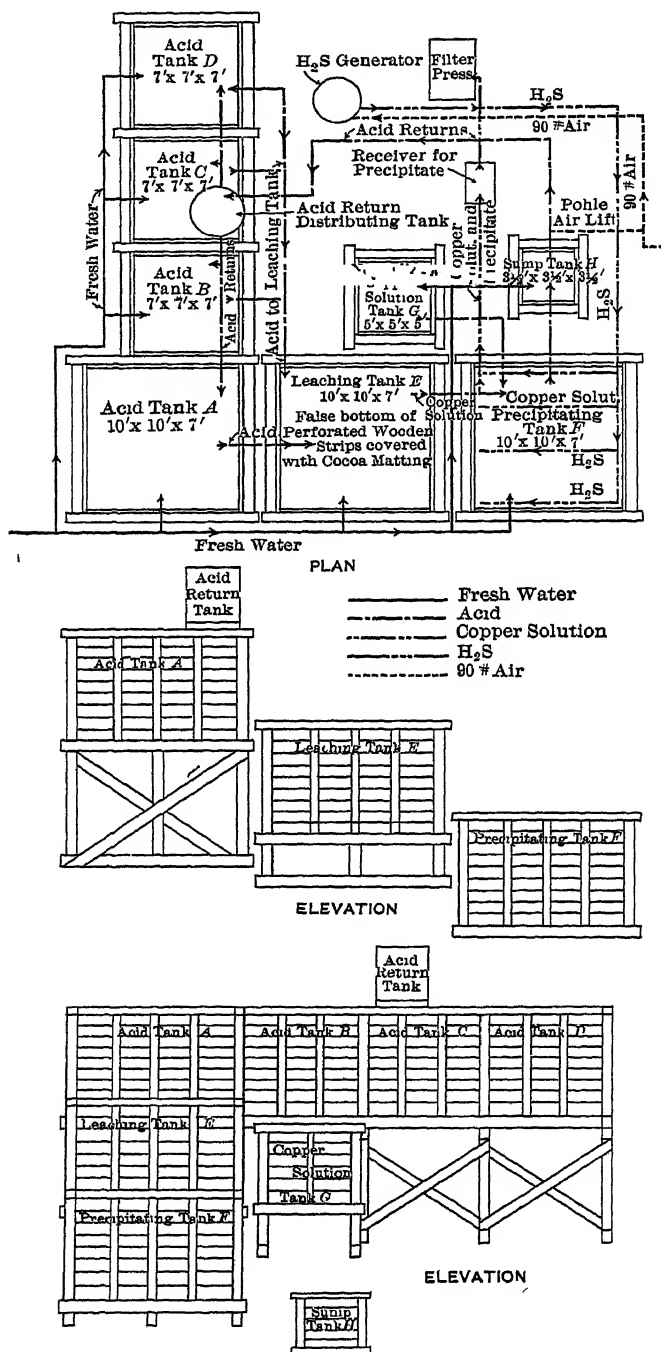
PLAN AND ELEVATIONS OF EXPERIMENTAL LEACHING PLANT.
